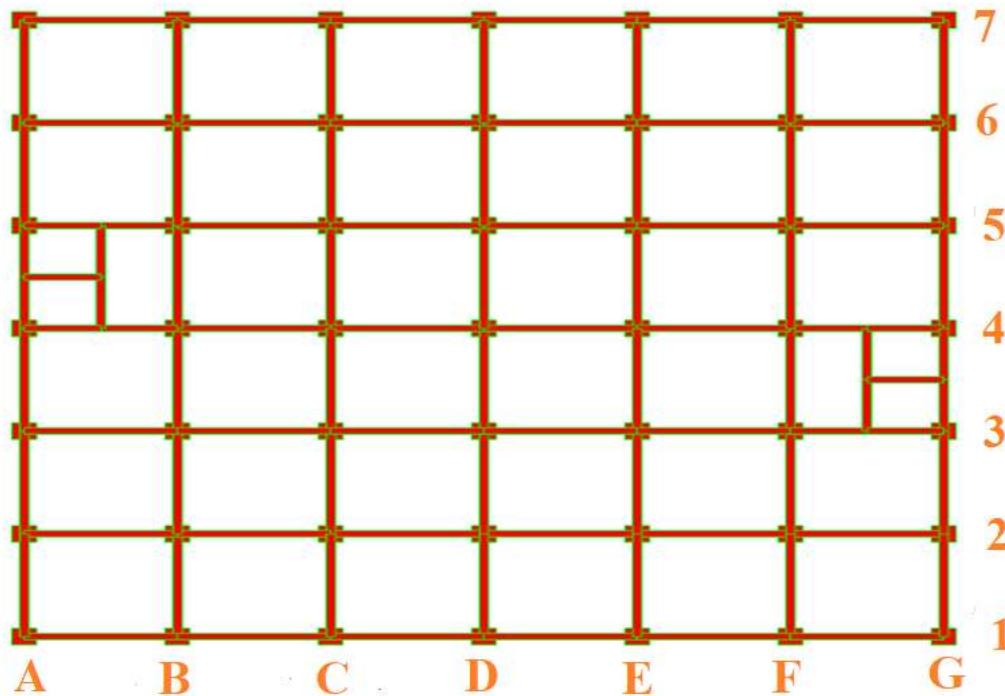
Typical floor plan for the 11-story building (similar for both fixed and flexible base)
